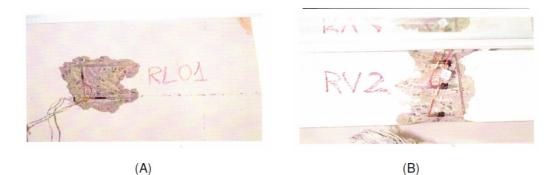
(A) Instrumentation of Ground floor Ground floor slab 01 (deformation in longitudinal and transverse reinforcement). (B) Instrumentation of beam V2 (deformation in longitudinal reinforcements)
